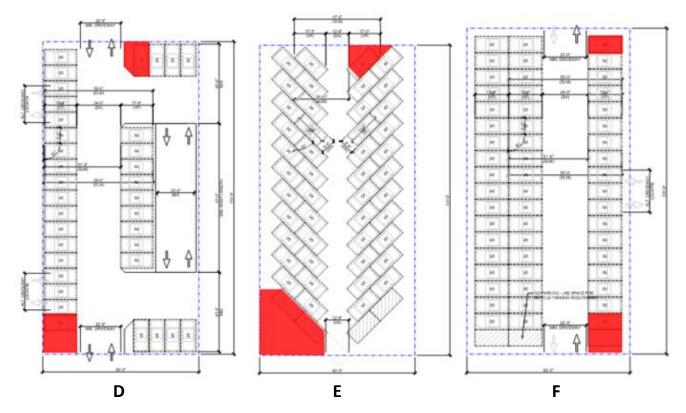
on page 11 details the 85-foot by 170-foot site parking design concepts, using Walker parking design standards, which yield an estimated 58, 45, and 52 parking spaces from left to right and denoted as D, E, and F.
